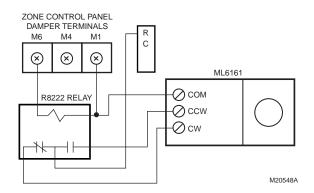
MARD or ML6161 Damper Motor Actuator using R8222 Relay wiring.
